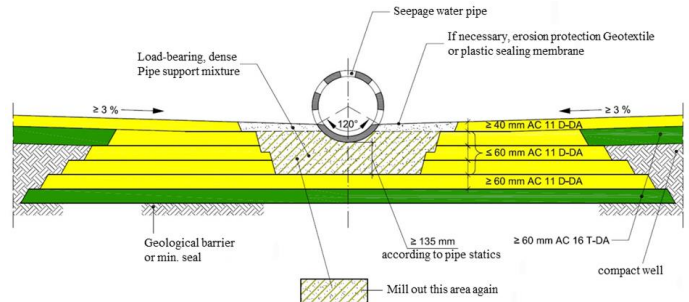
Pipe support for variant A (exemplary principle sketch in milled construction, adapted to a standard paver with a minimum pave width of 2.5 m) [13]
